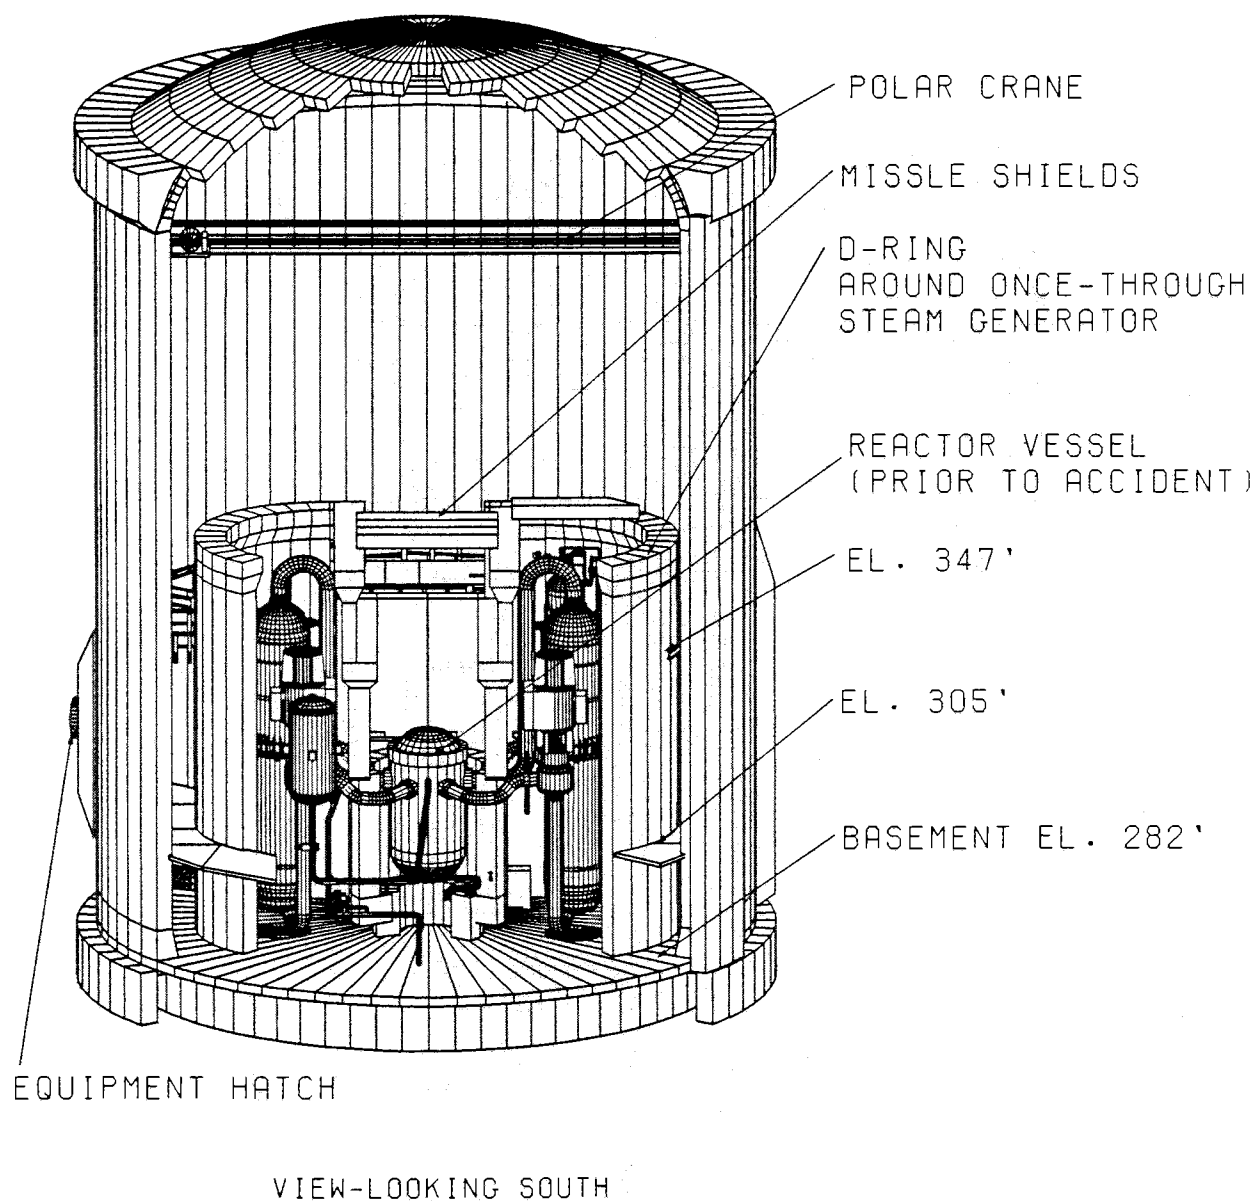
TMI-2 Containment Building (View — Looking South)
